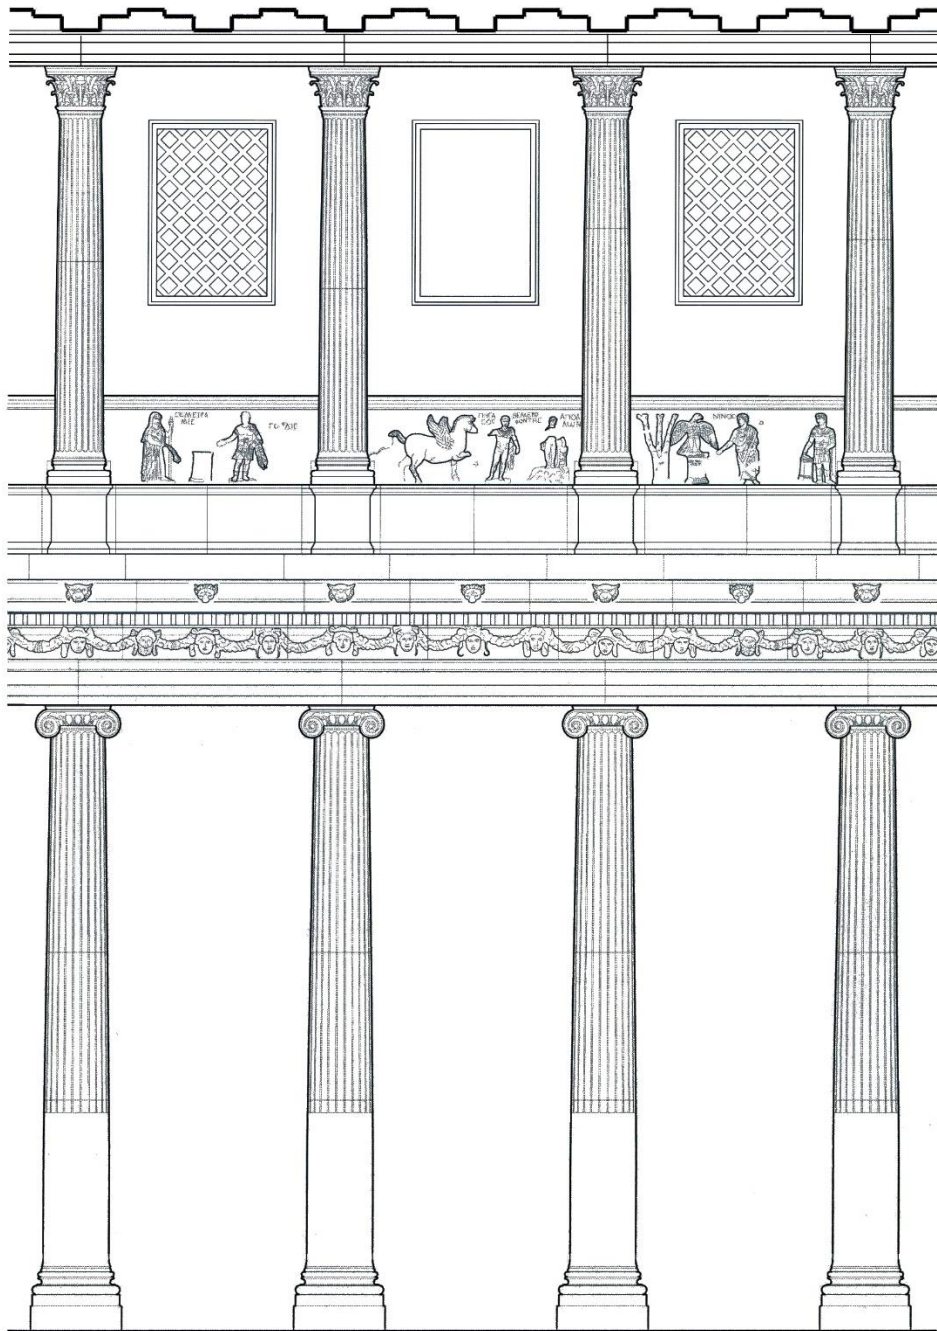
Reconstruction of the placement of the relief panels in the central section of the eastern colonnade of the Civil Basilica (after Yıldırım 2008).
